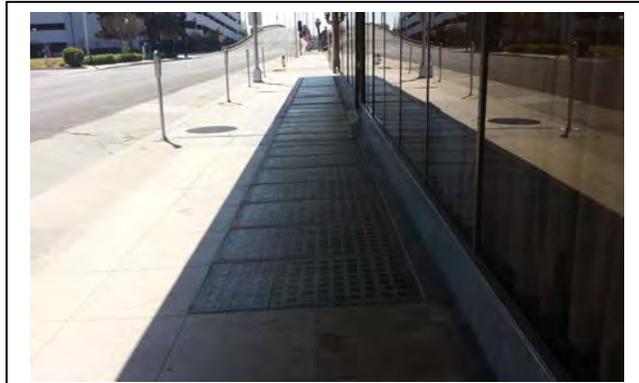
San Joaquin Light and Power Corporation Building Basement Vault Lights
